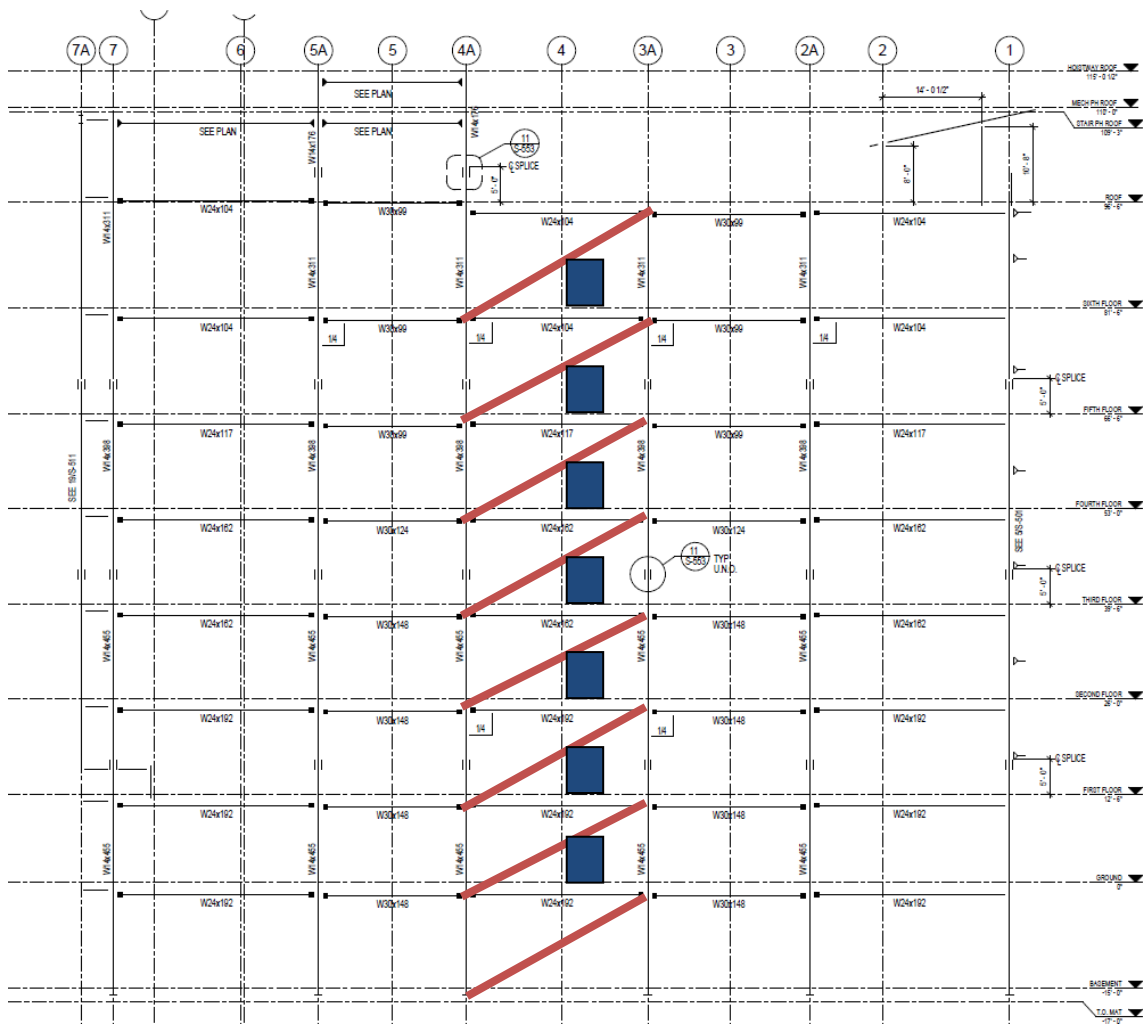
DAMPER IMPLEMENTATION IN FRAME A
